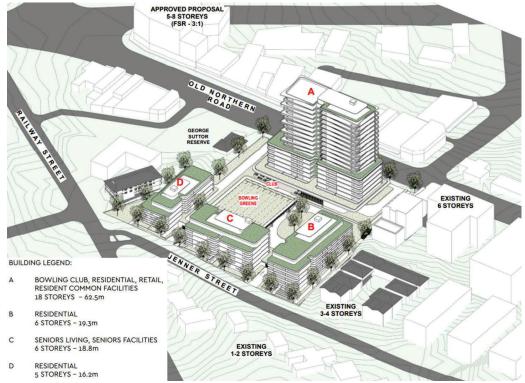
Indicative Site Layout and Building Height Plan (maximum number of storeys) (Source: Altis)
